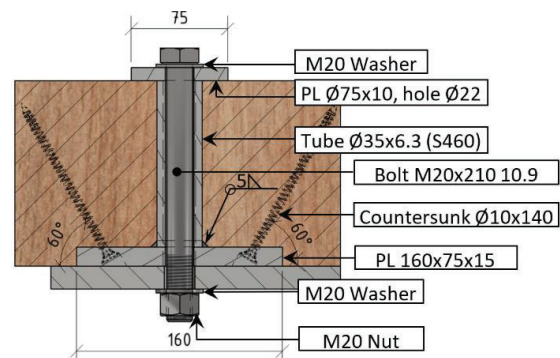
Details of shear connection type 3 (SCT-3), longitudinal cut.
